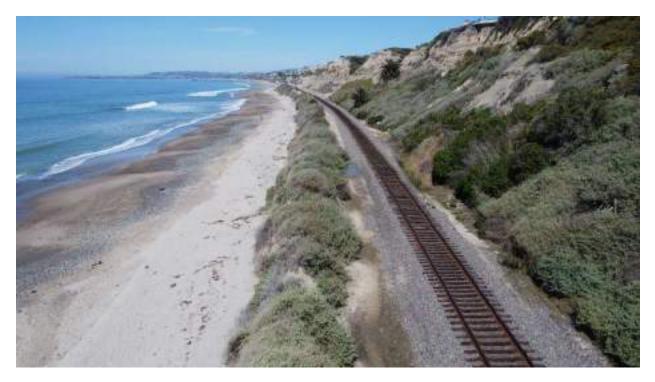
Near Northern End of Proposed New Engineered Revetment, Replacing Eroded Berm And Vegetation
